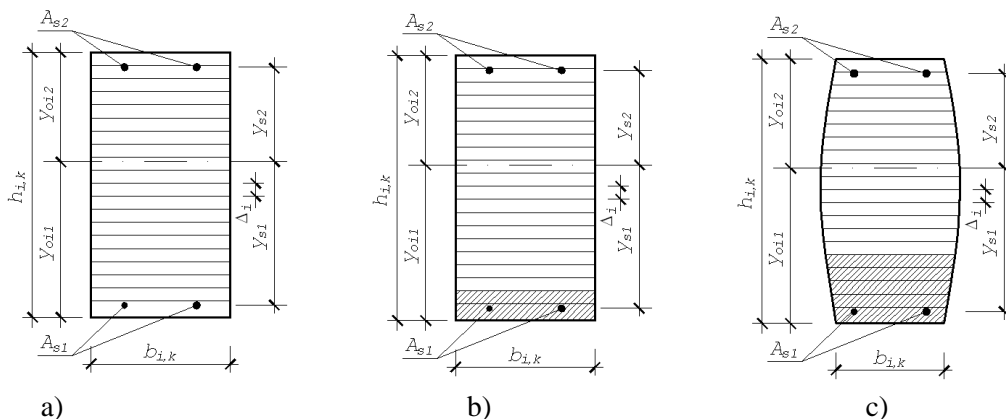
The cross-section of reinforced concrete beams: a) before the appearance of normal cracks; b) after the occurrence of normal cracks; c) during intense corrosion of concrete
